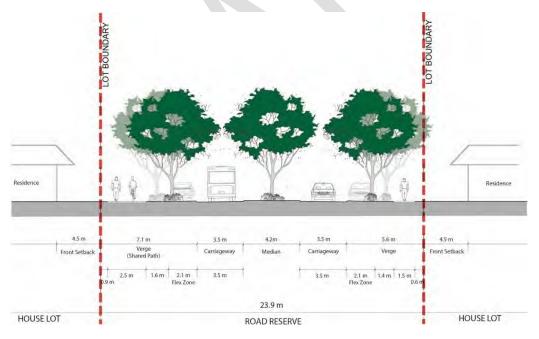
Collector Road Cross Section – Median (Flex Zone)
